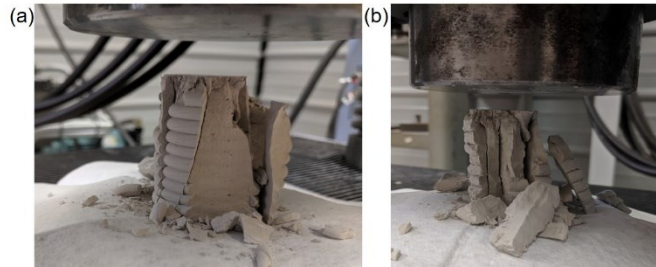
Compression test performed on 3D printed parts (a) printed with a circular nozzle and (b) printed with a square nozzle
